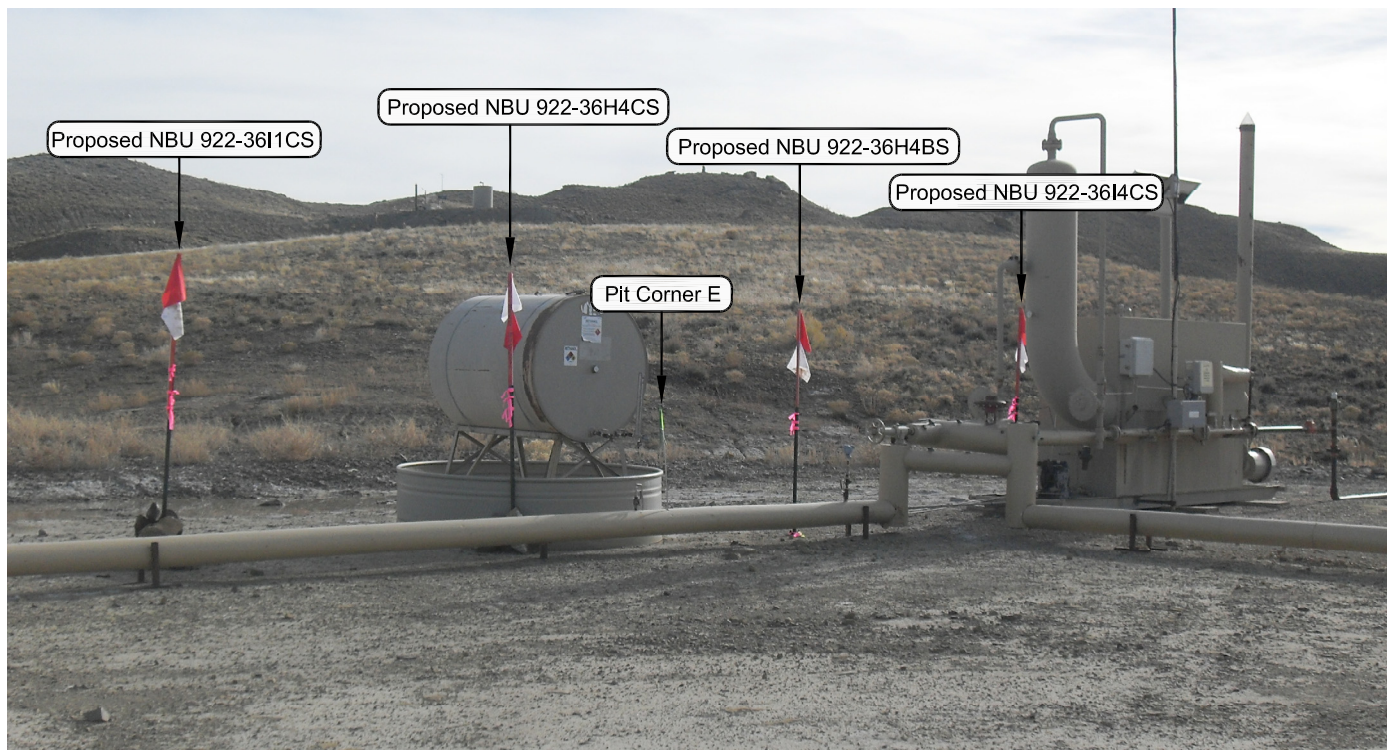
PHOTO VIEW: FROM LOCATION STAKE TO PIT CORNER E
